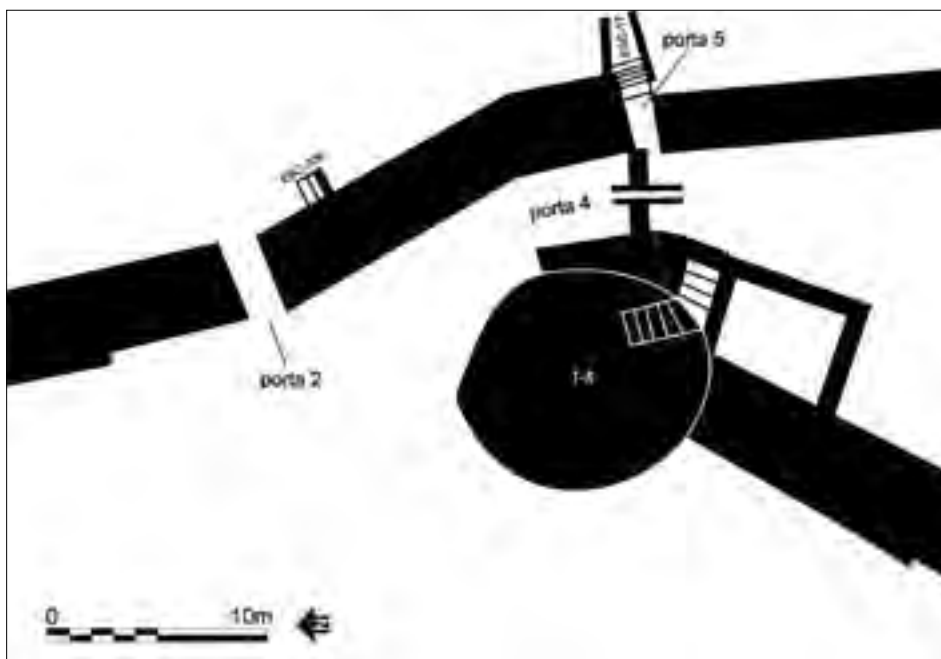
Plan of Gate 4 at Puig de Sant Andreu. Source: Prado 2009, 341, Fig. 7.
